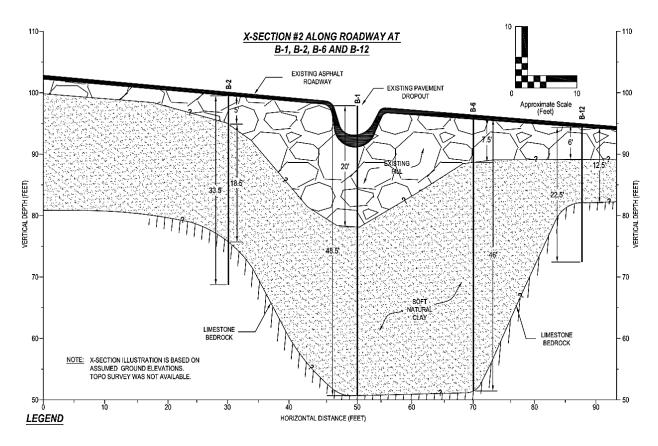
Cross section of pavement and location of some borings within the existing dropout
